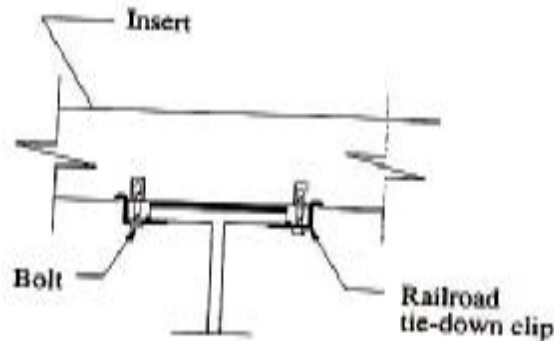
Tie-down connection of the Bloomington Bridge
